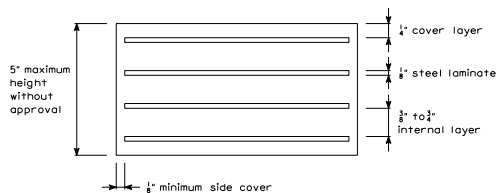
Steel reinforced elastomeric bearing design requirements
